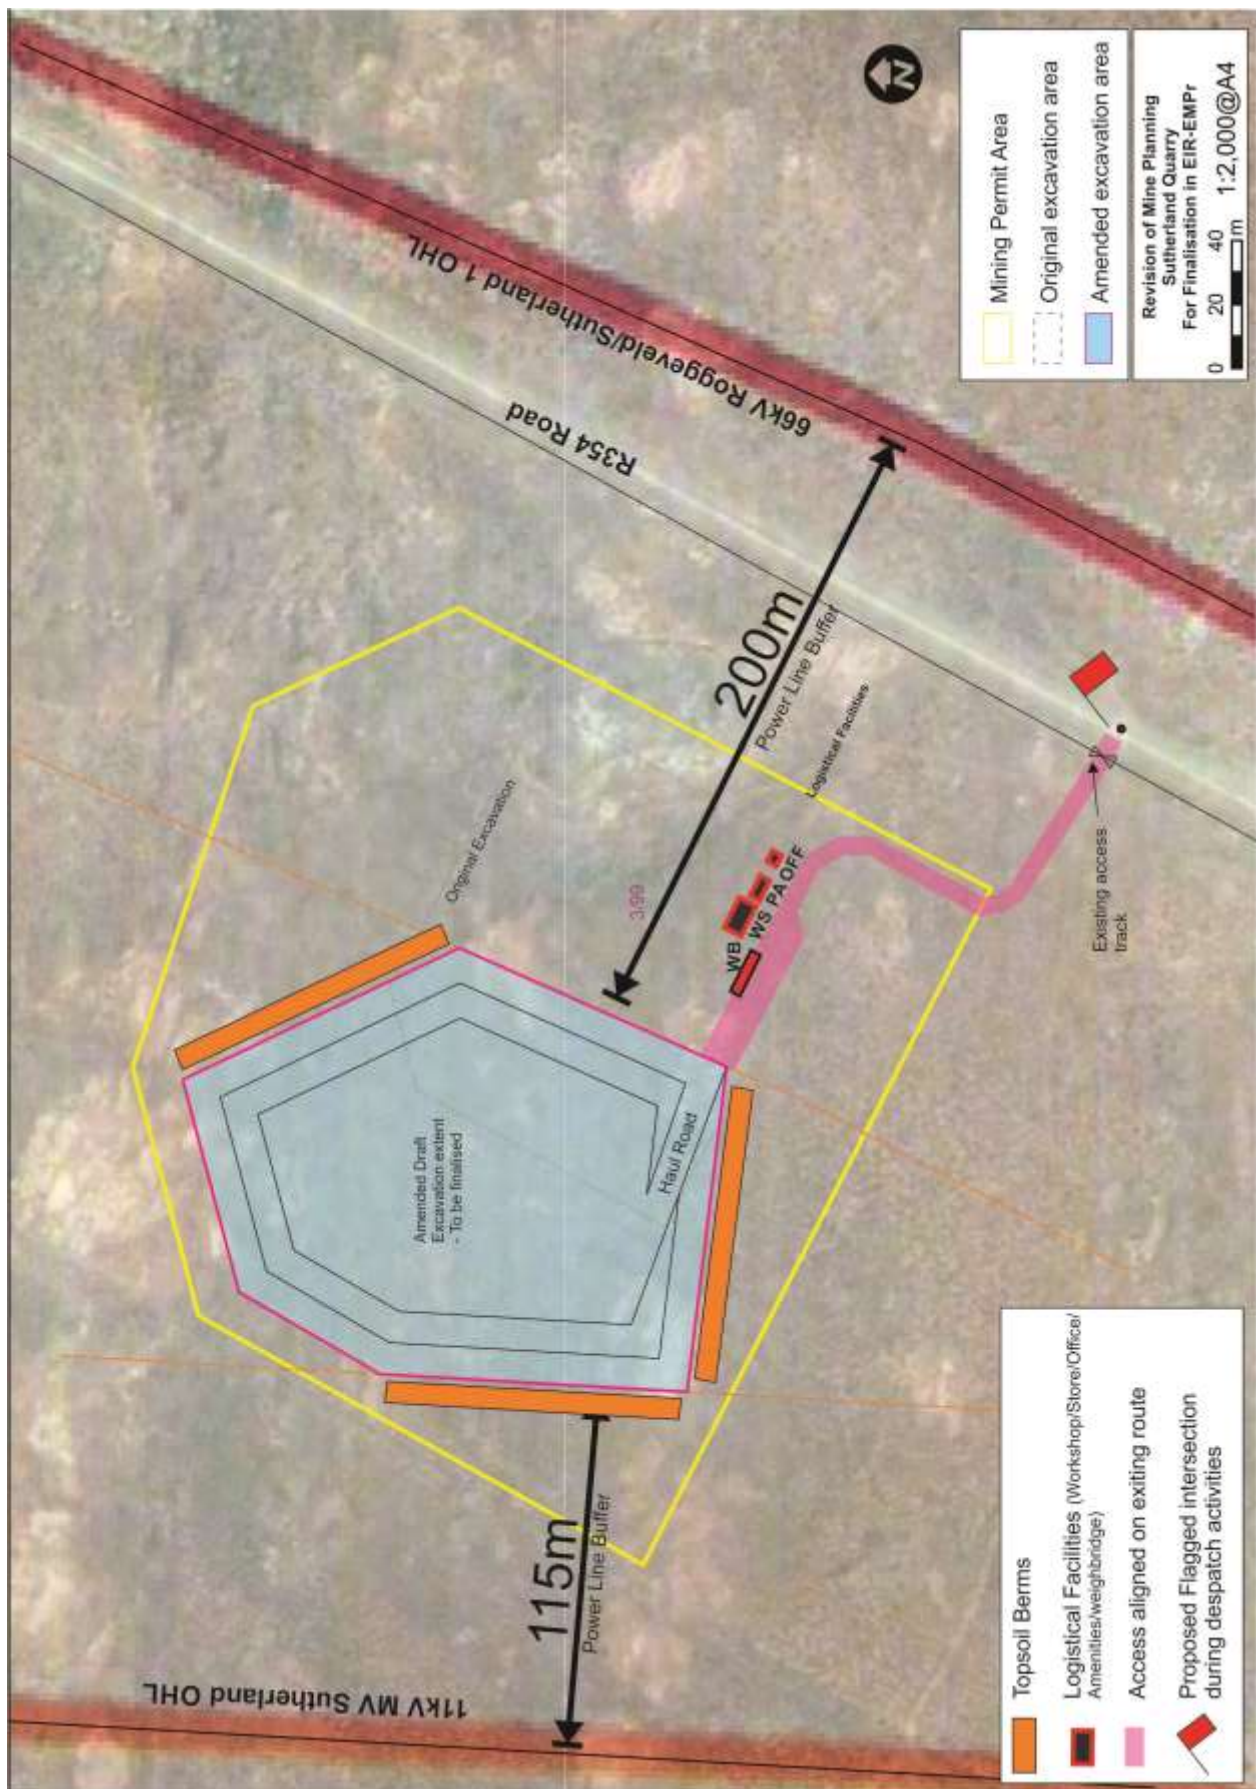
Revised Mine Planning indicative excavation area – Draft only at this stage.
